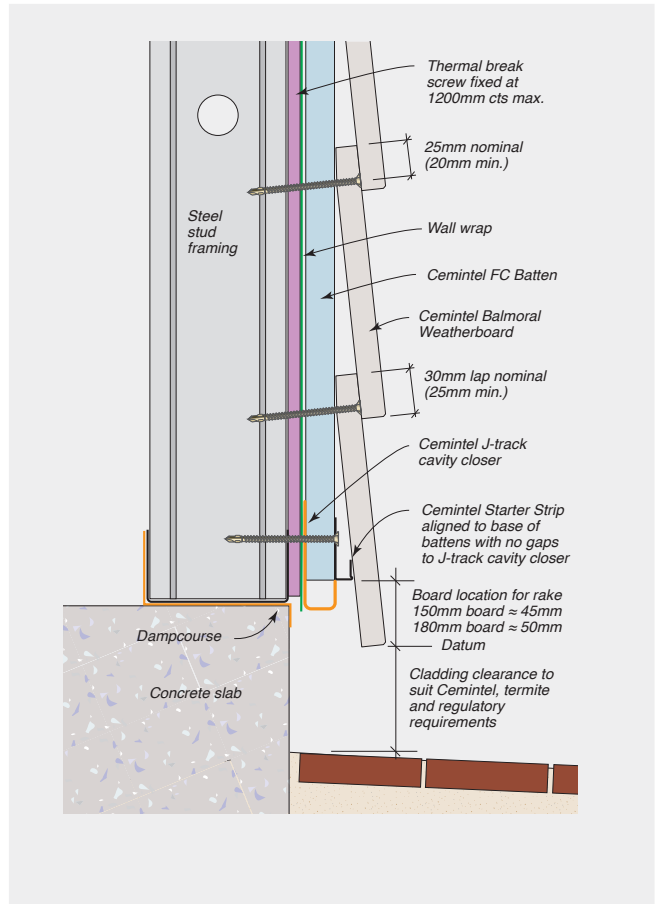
Typical Screw Fixing to Steel Studs Over Thermal Break and Battens
